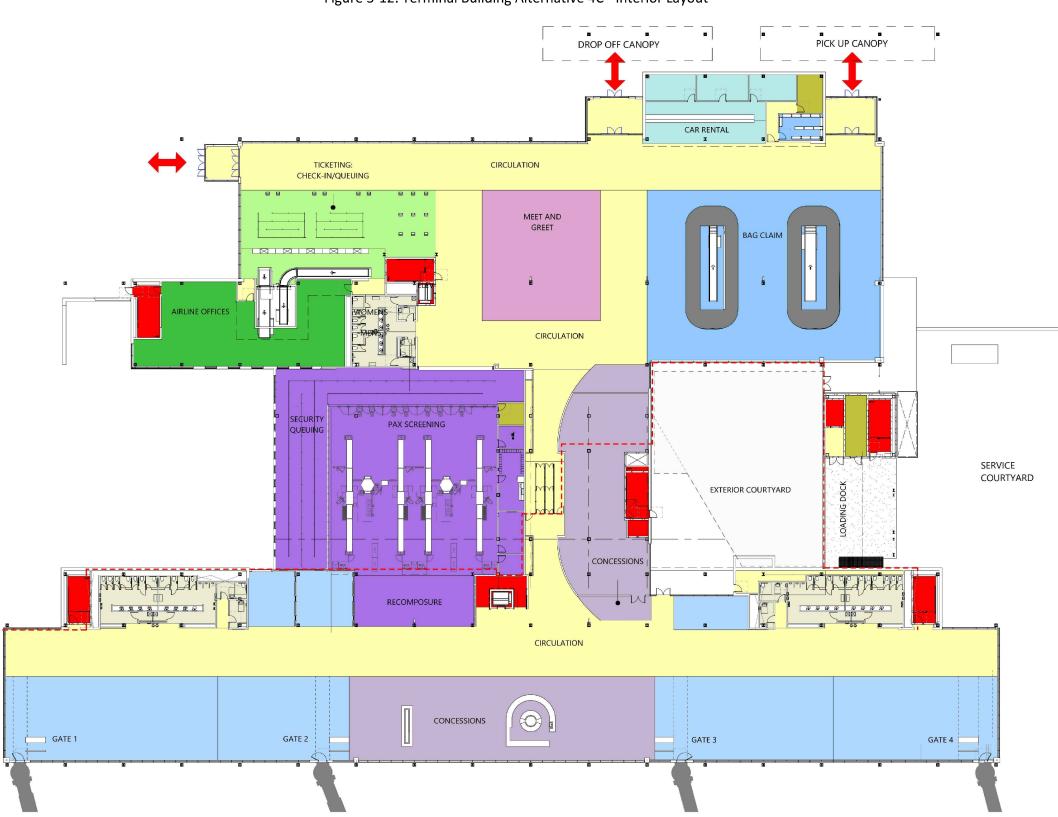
Terminal Building Alternative 4C - Interior Layout
